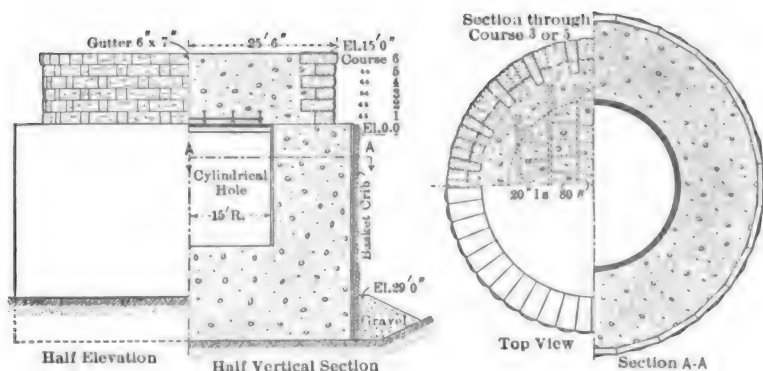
COFFER-DAM FOR PIVOT PIER, CHELSEA BRIDGE.
